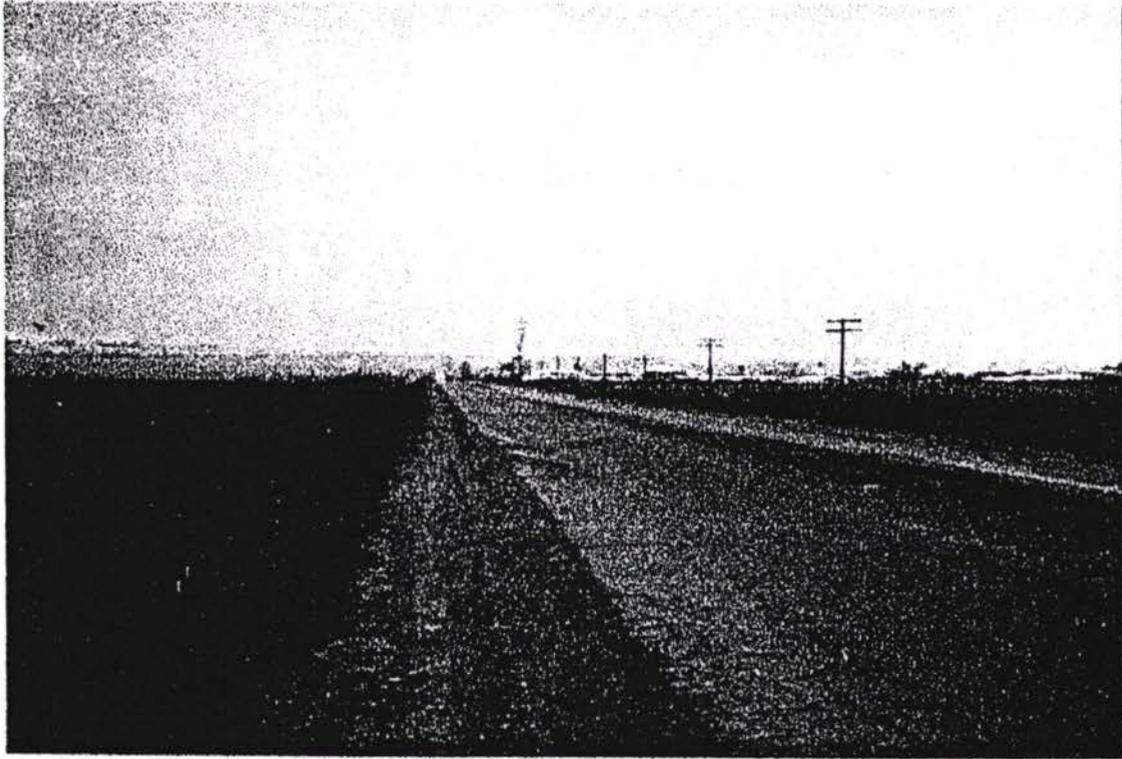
Typical road view between Ganja bypass- Shamkir (at 120 km from border)
